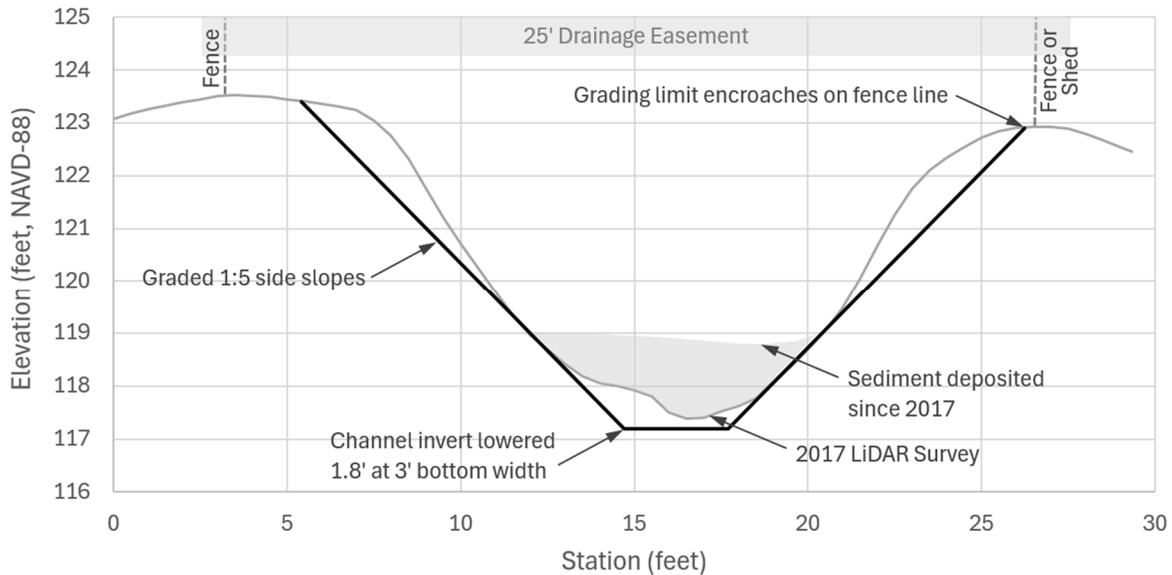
Alternative 5 representative graded section between Paul Avenue and Rogge Road.
